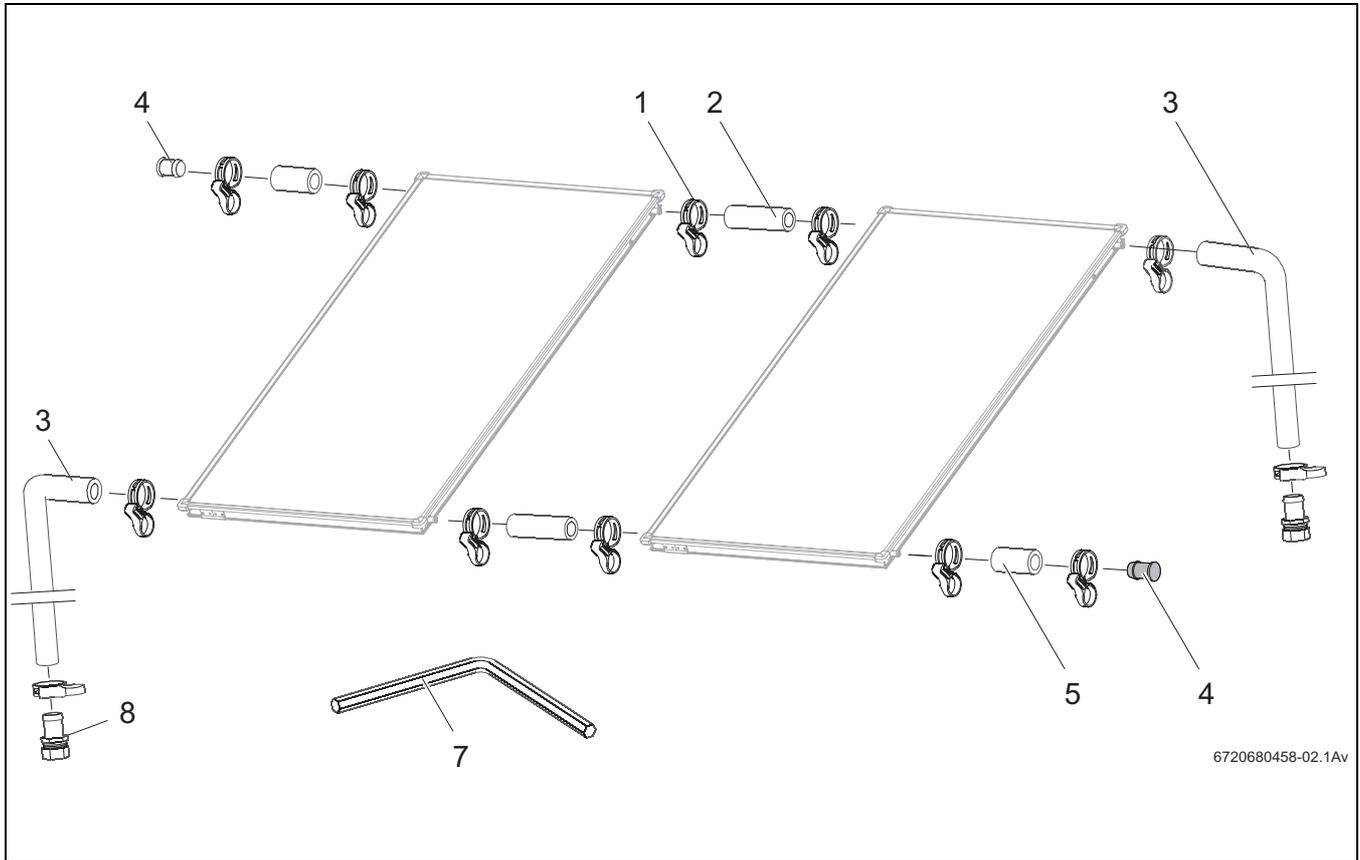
Connection set and joining set (diagram with 2 vertical collectors)
